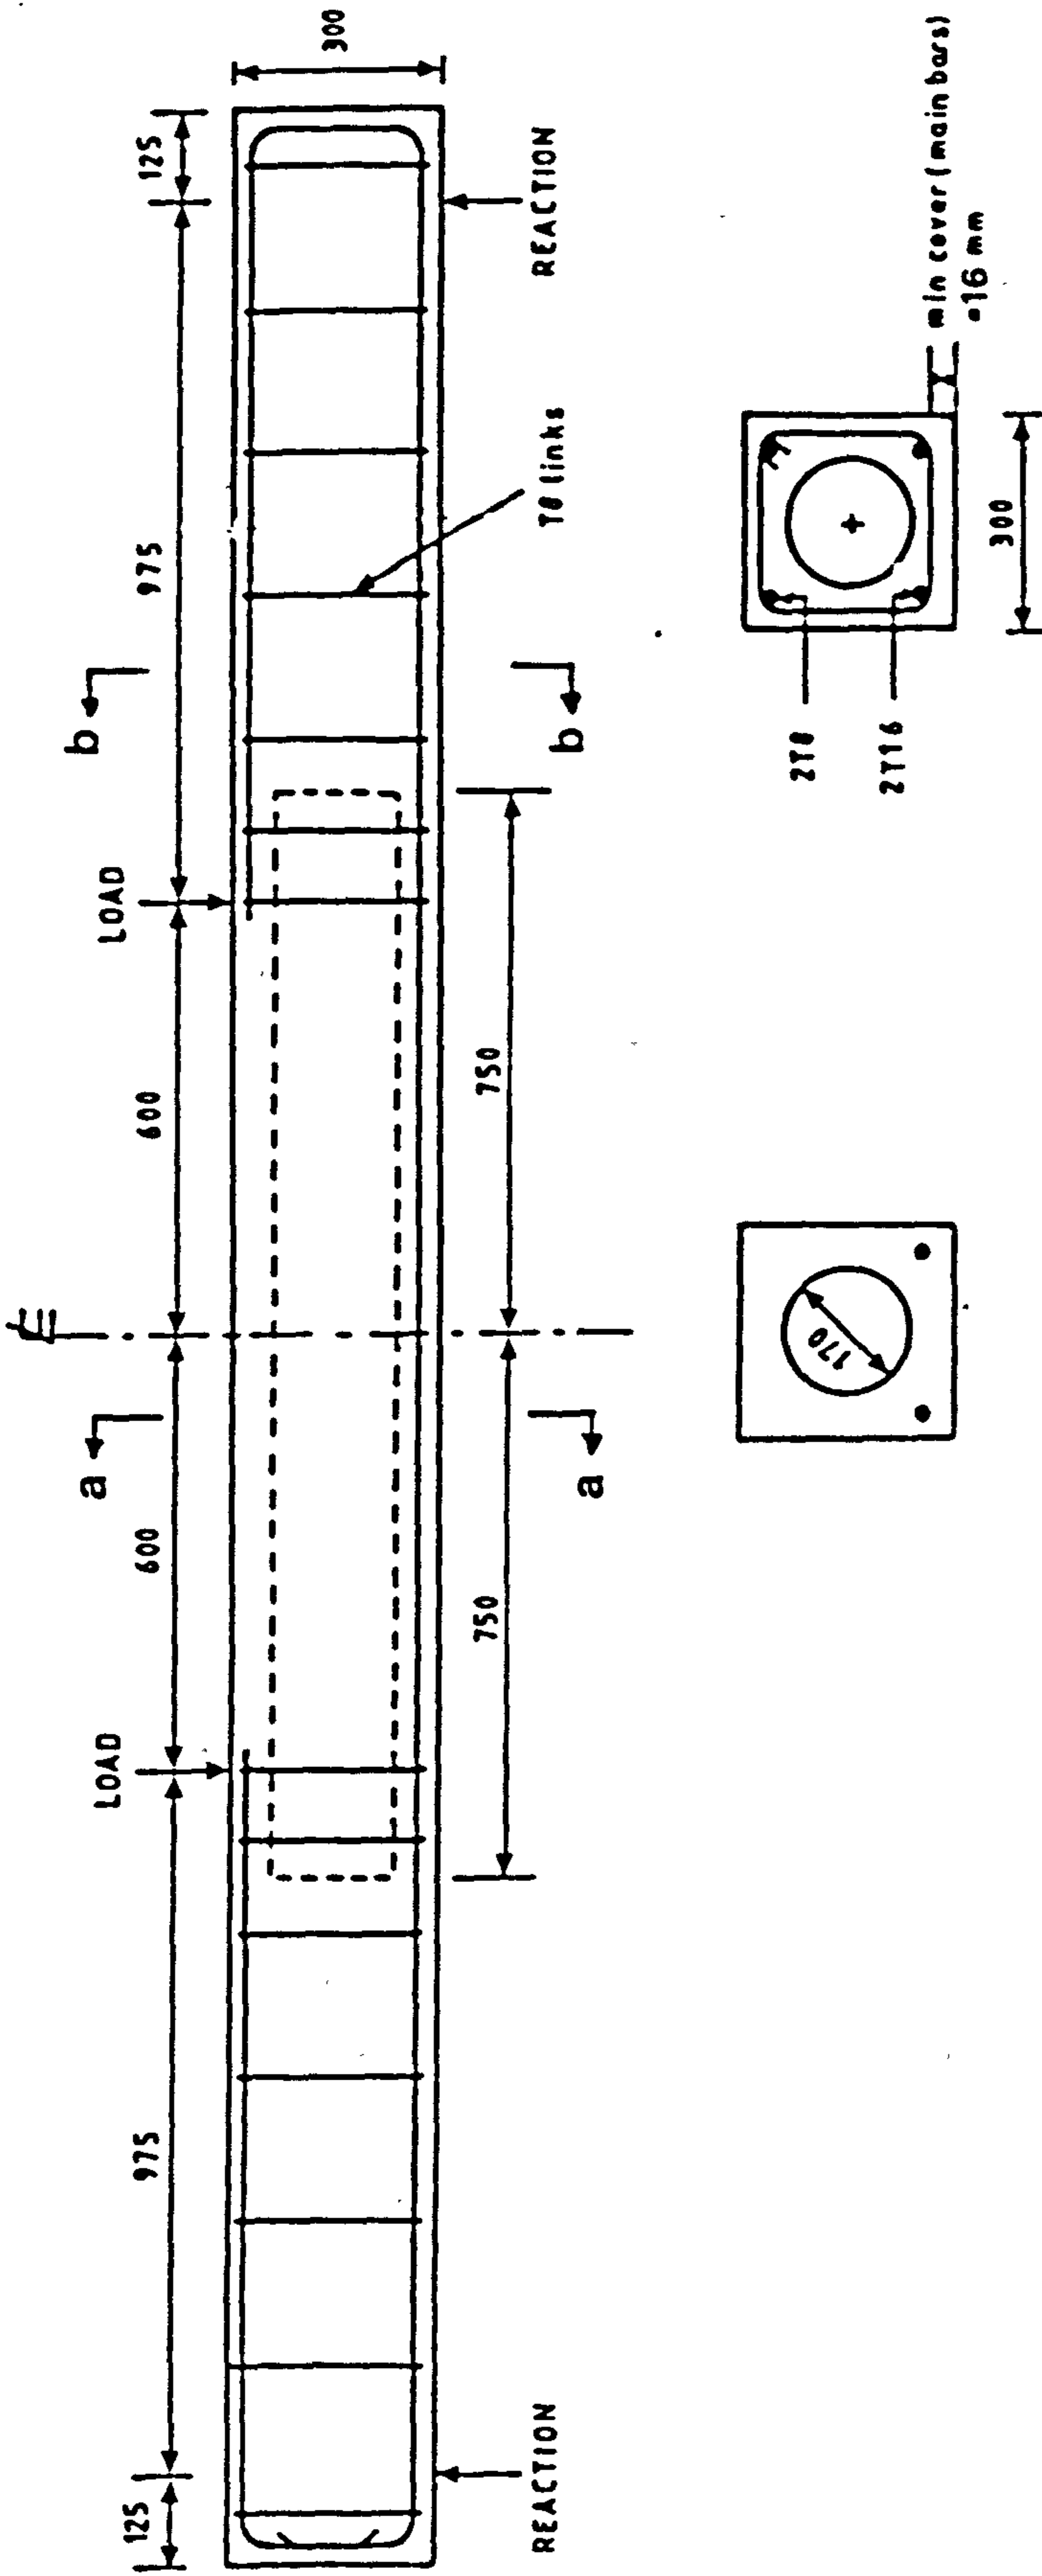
Dimensions and reinforcement details of a typical voided slab strip, L9, (Ref. 8).
